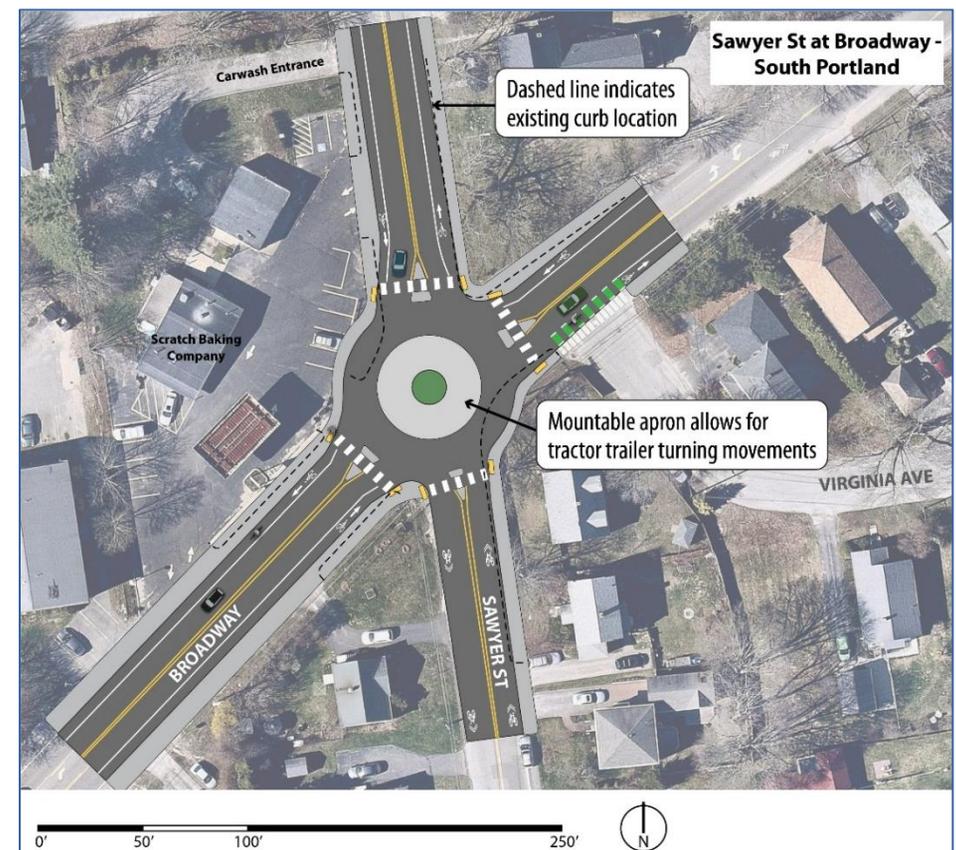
Modern Roundabout at Broadway/Sawyer Street
